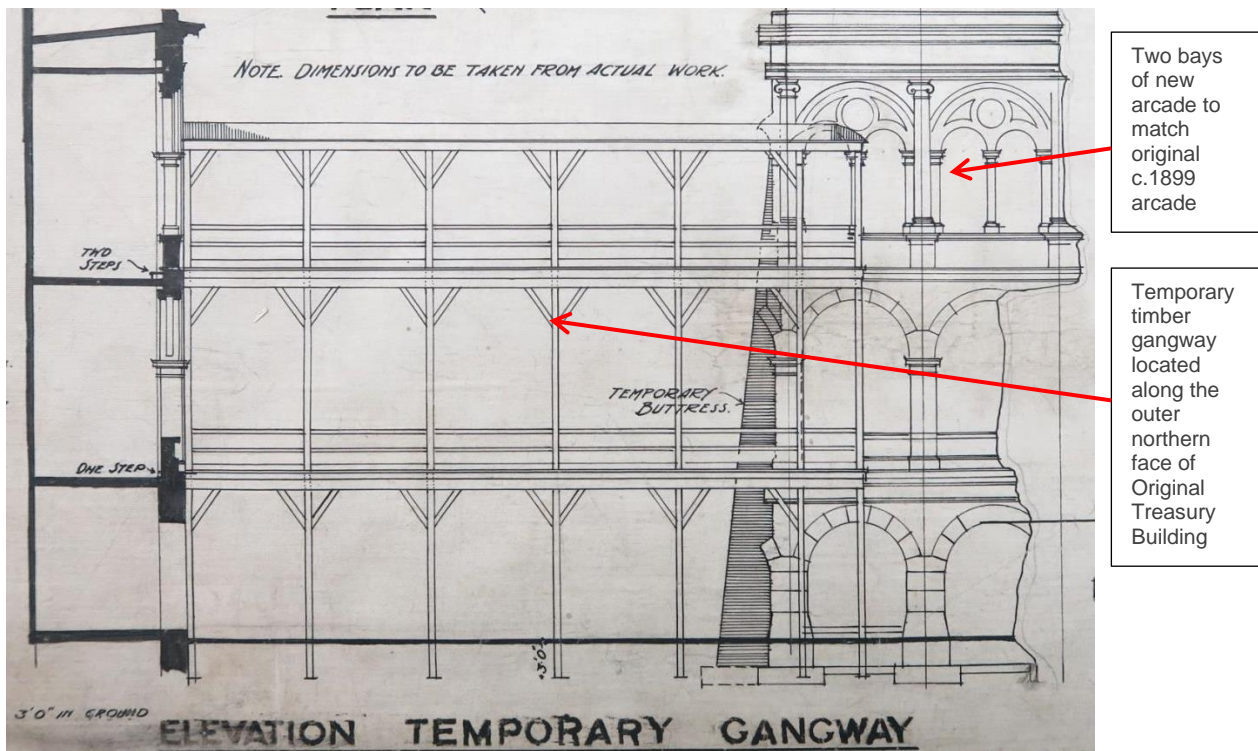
1916 George McRae proposed Plans – Elevation of temporary gangway looking south
